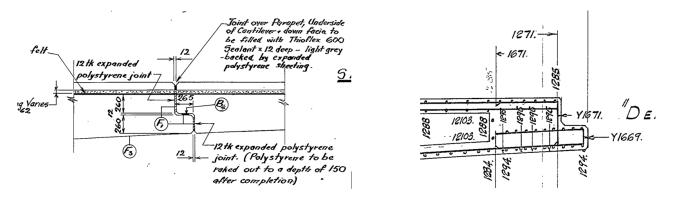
Half-joint details (Extract from record drawing 40062 general arrangement)
